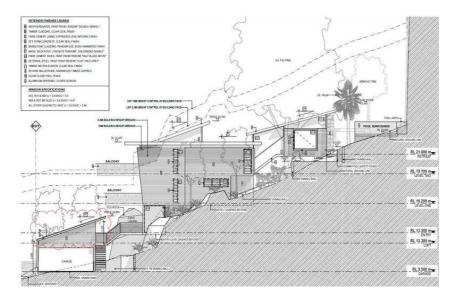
elevation of DA Approved House at 1a Elanora Rd, Elanora Heights (the lot west of subject site). This house is 3 storeys high and is clearly in breach of the 8.5m maximum LEP. this house is larger in scale and bulk to that proposed at the subject site. This house was approved under the current planning instrument.
